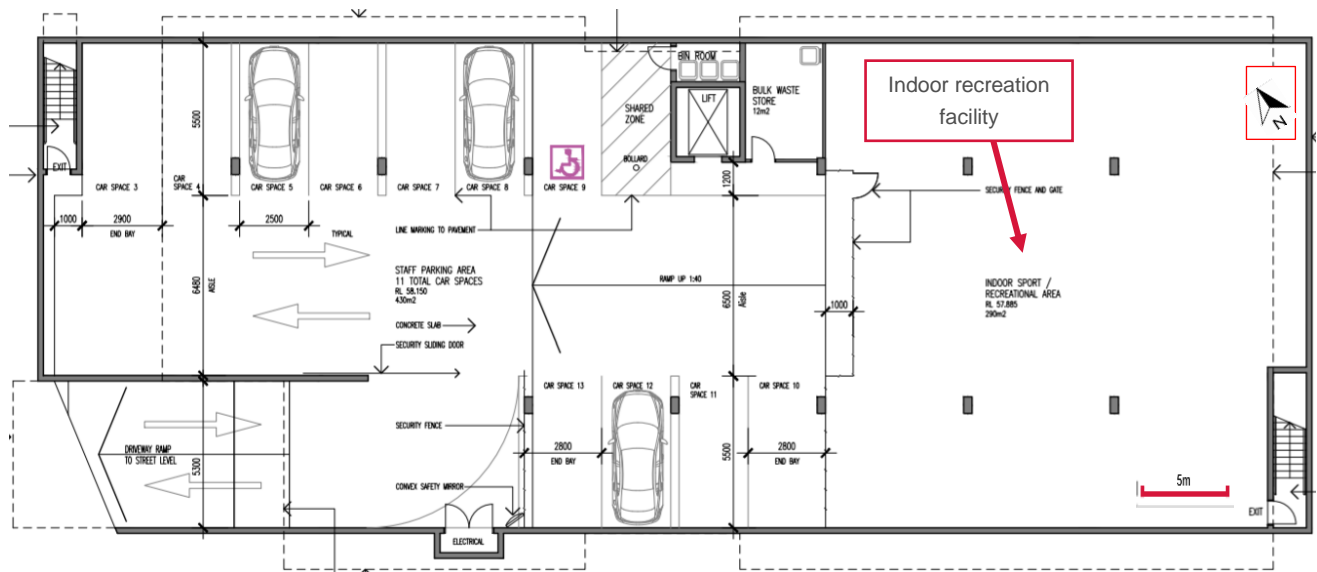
Indoor sporting facility (Source: Applicant's EIS)
